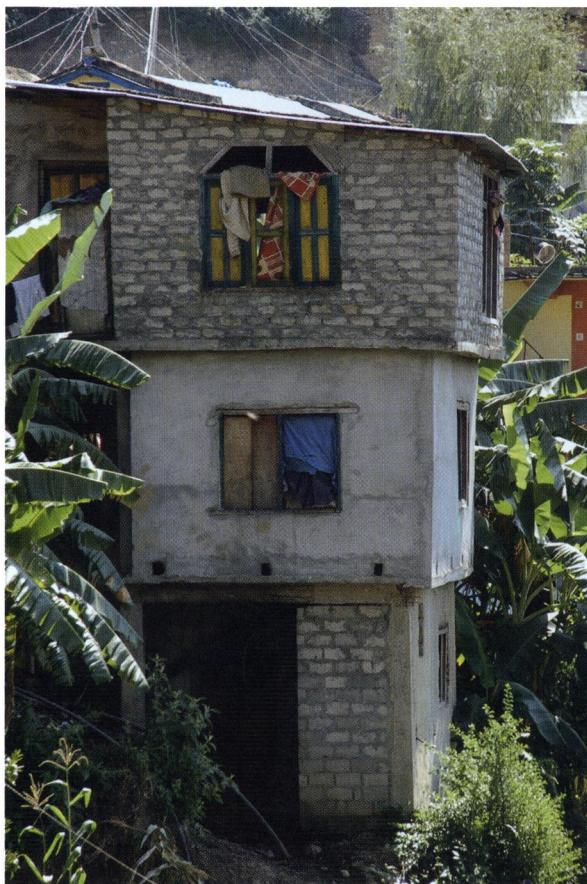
Partly framed Reinforced Concrete with soft storey and vertical irregularity (unsupported columns on upper floors) (Photo: J. ANHORN 2012)
